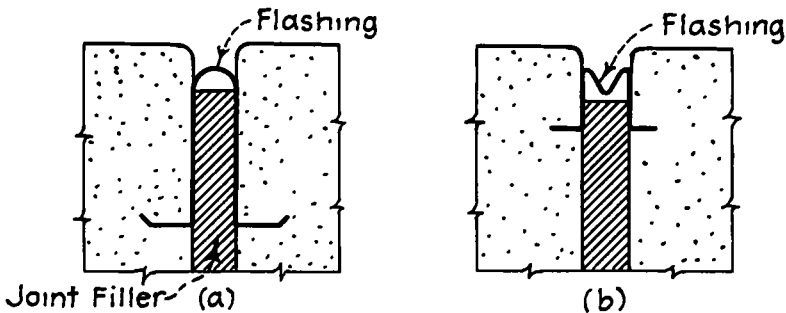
TYPICAL SHEET METAL FLASHINGS
